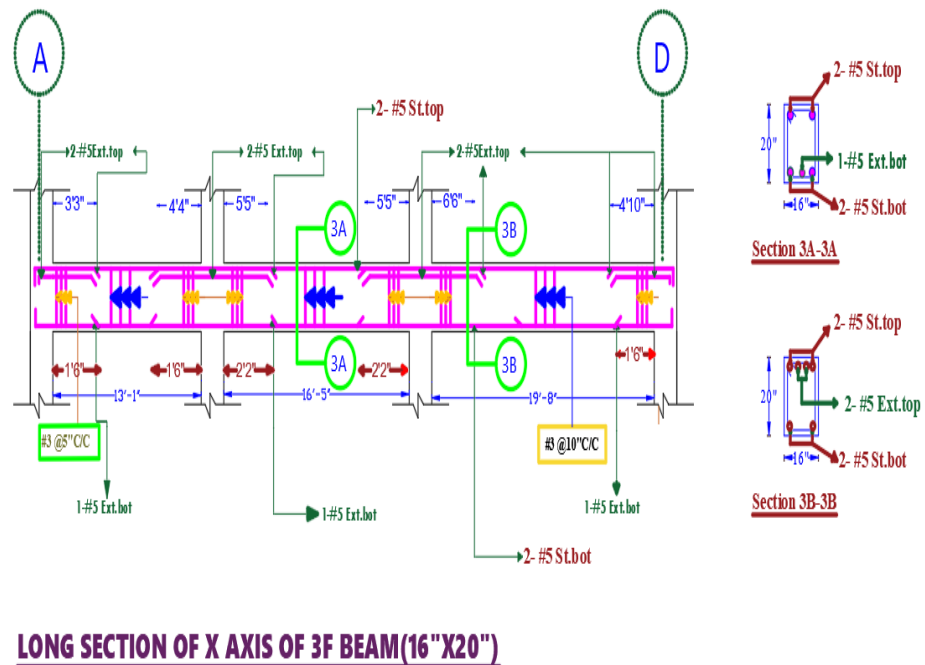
Long and Cross Sections of X Axis of 3RD Floor Beam (16" X 20")
